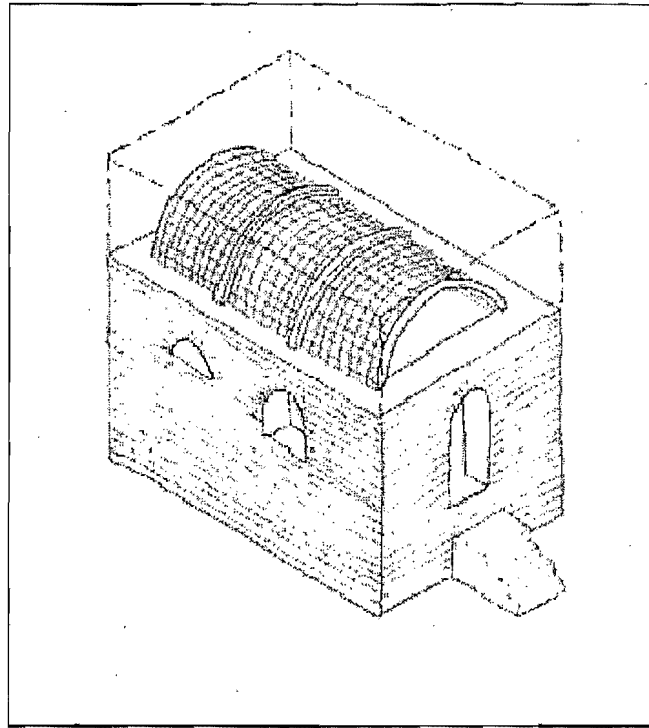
Sketch of curved-roof construction (single vault).⁷²
